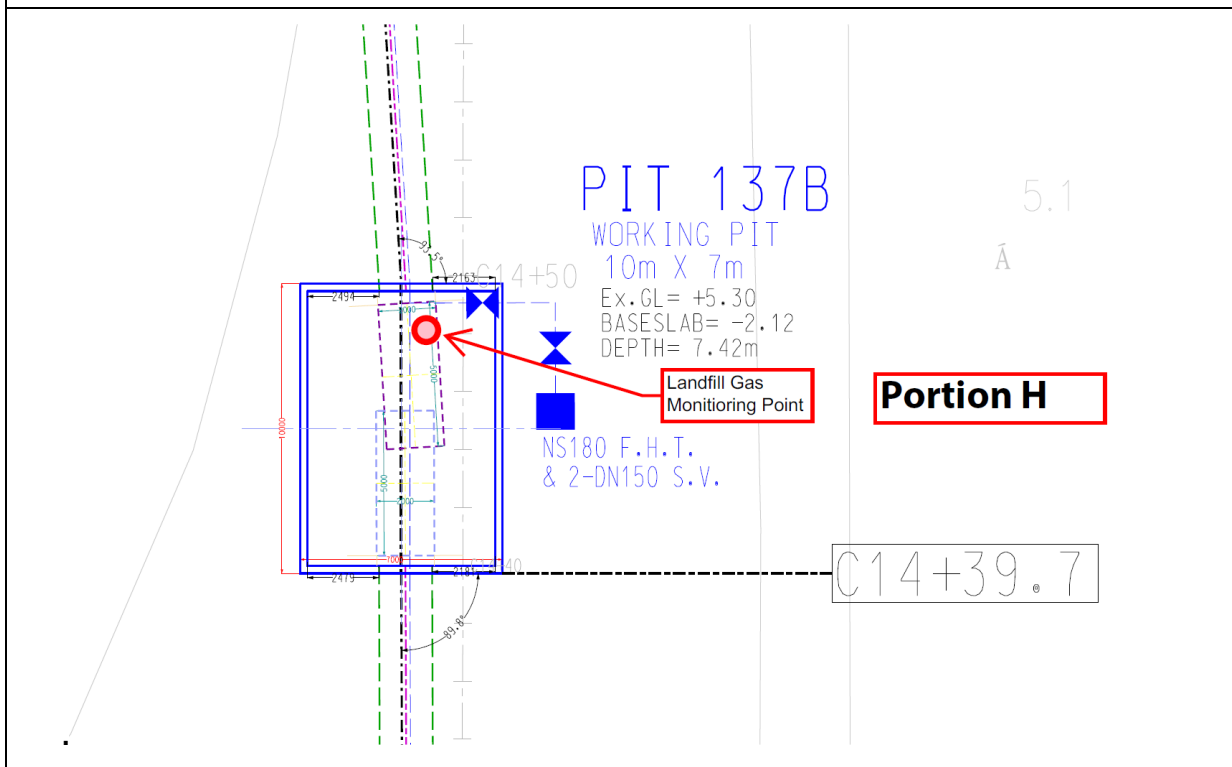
Monitoring Location – Pit 137B (137 Pit B)
